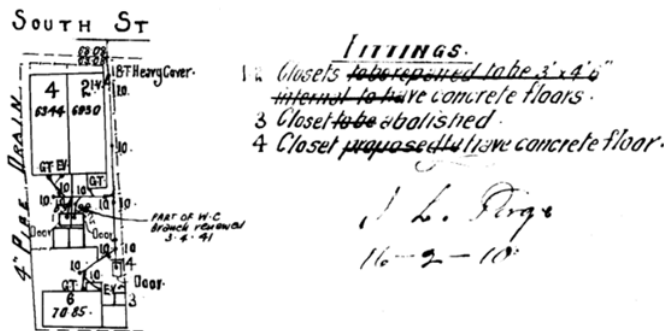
Metropolitan Drainage Board, 1910 Plan of Drainage for the site showing 2, 4 and 6 South Street as separate residences. Source: Council archives, plan H2599.
